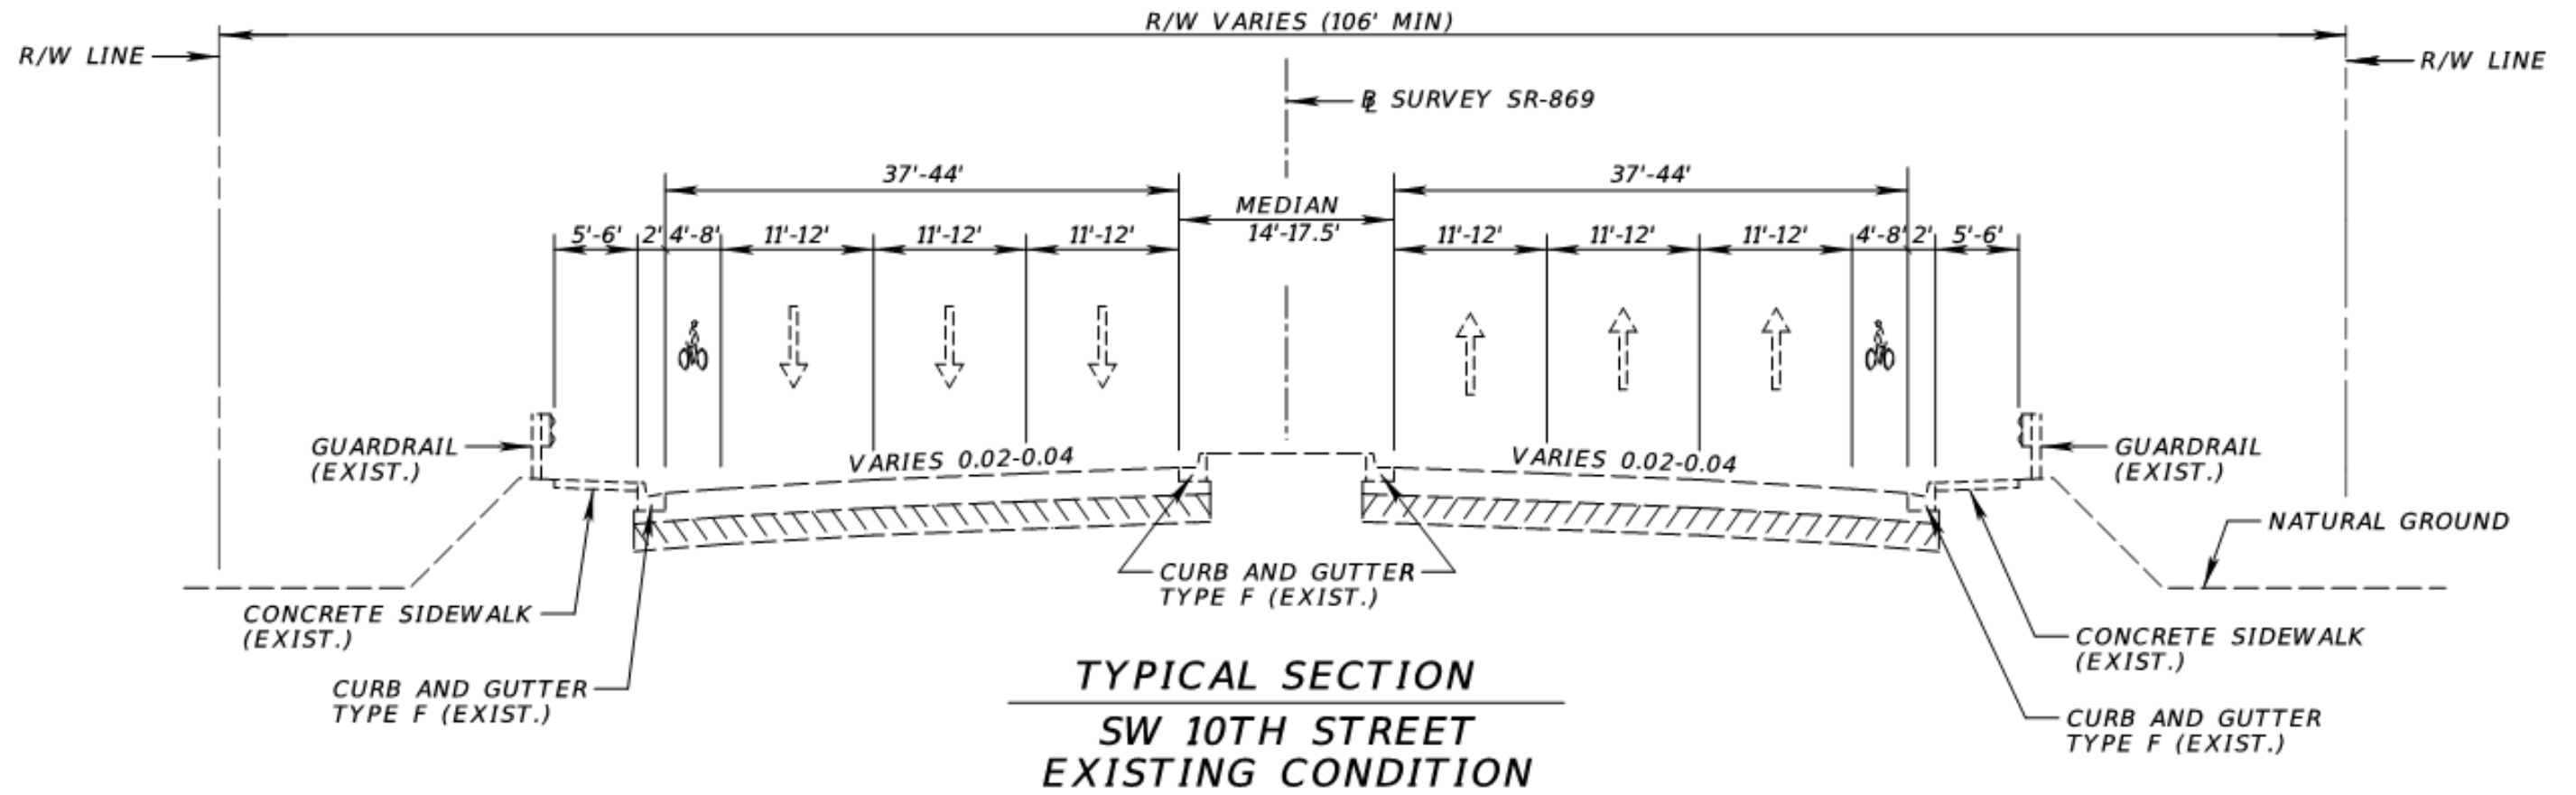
4: Existing Typical Section - SW 10<sup>th</sup> Street
